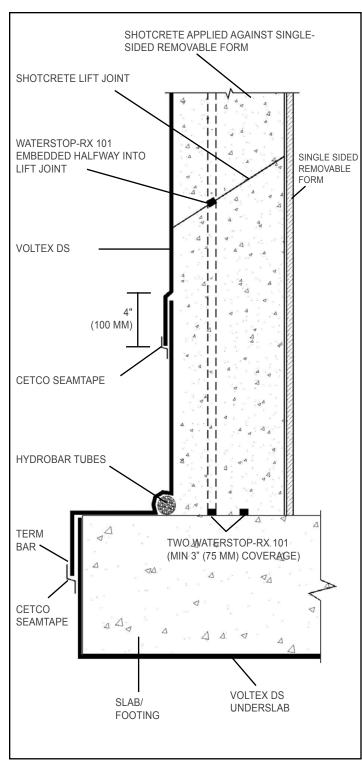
HYDROSTATIC BACKFILLED SHOTCRETE WALL
